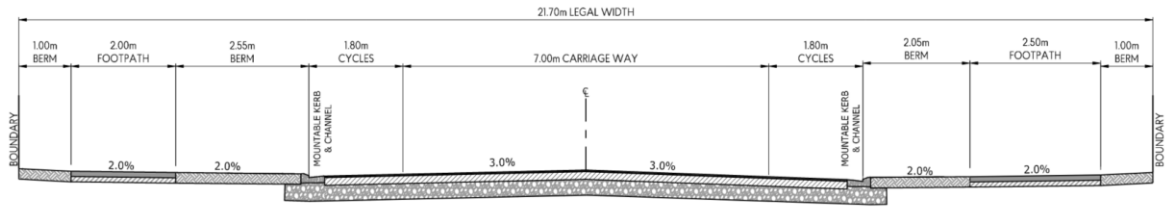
Typical Cross-Section (B) Collector - 21.7m with Cycleway and Berm
